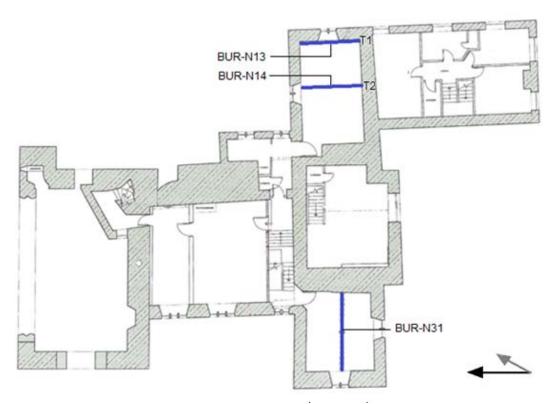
First-floor plan showing the location of the sampled timbers, samples BUR-N13, BUR-N14 and BUR-N31 (after Crosby Granger Architects 2018)
